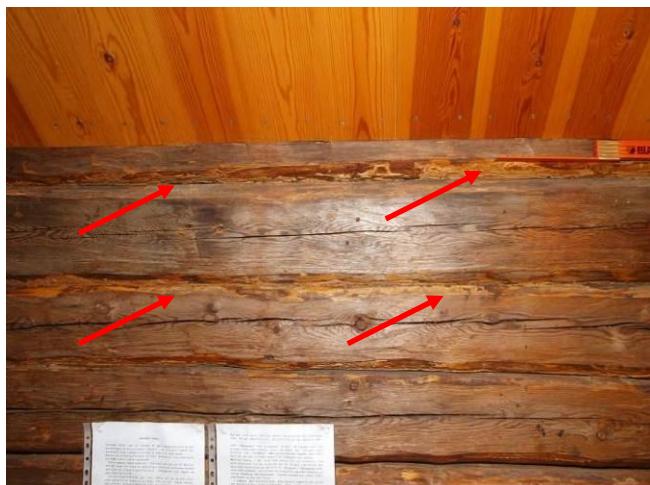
Chapel church hall room wall, which has damages by bark and longhorn beetles
